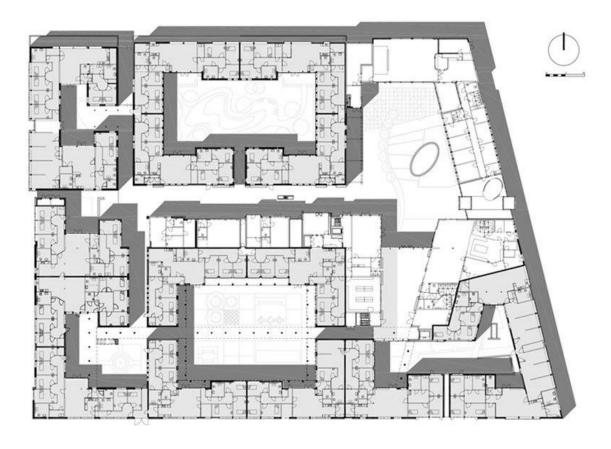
De Hogeweyk: Floor Plan of Second Level
